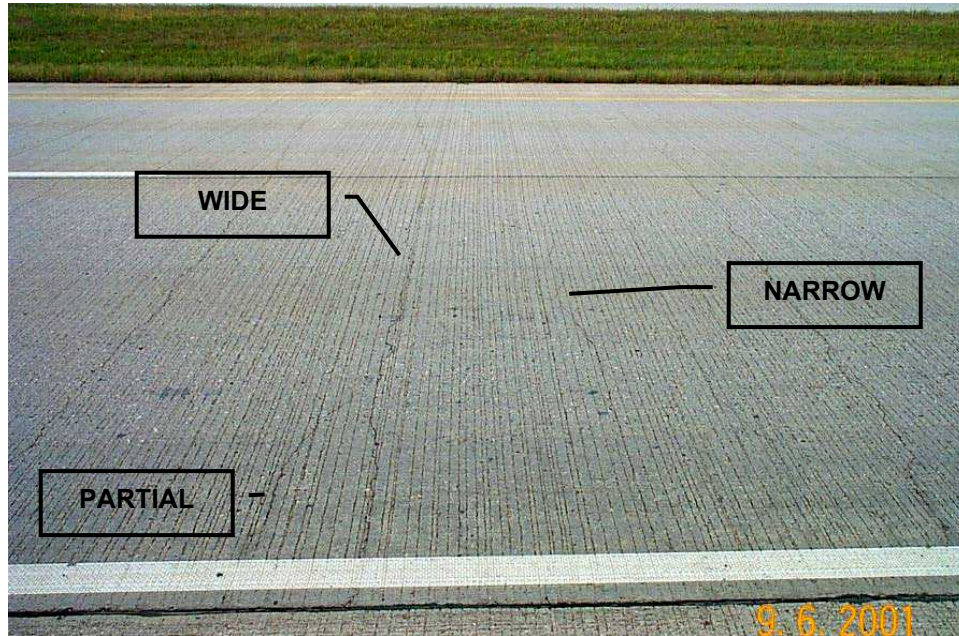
Depicts the narrow, wide and partial transverse cracks in the test section.
